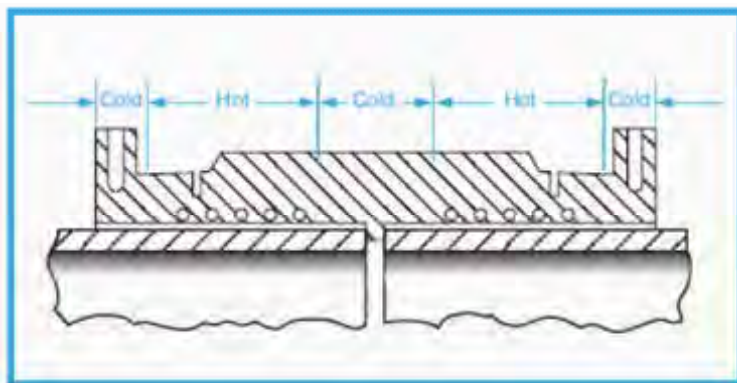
PE pipe joint indicating cold and hot zones
